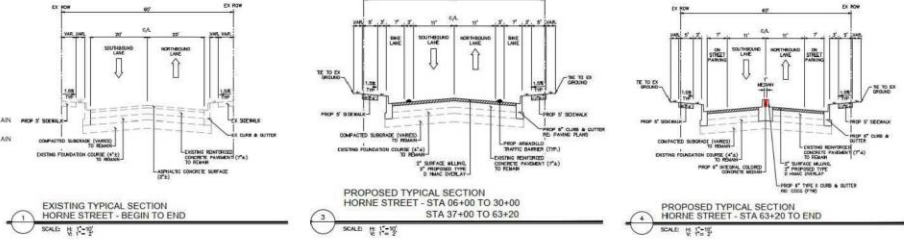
HORNE STREET IMPROVEMENTS
